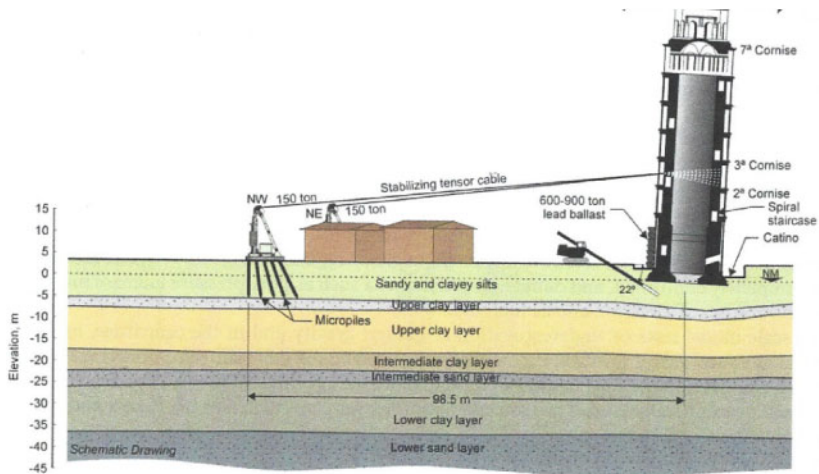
Scheme of the underexcavation and of the safeguard structure with steel stays.
